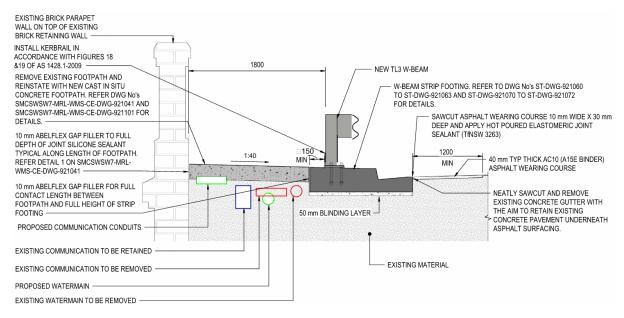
Cross section of the proposed countryside footpath behind TL3 w-beam
